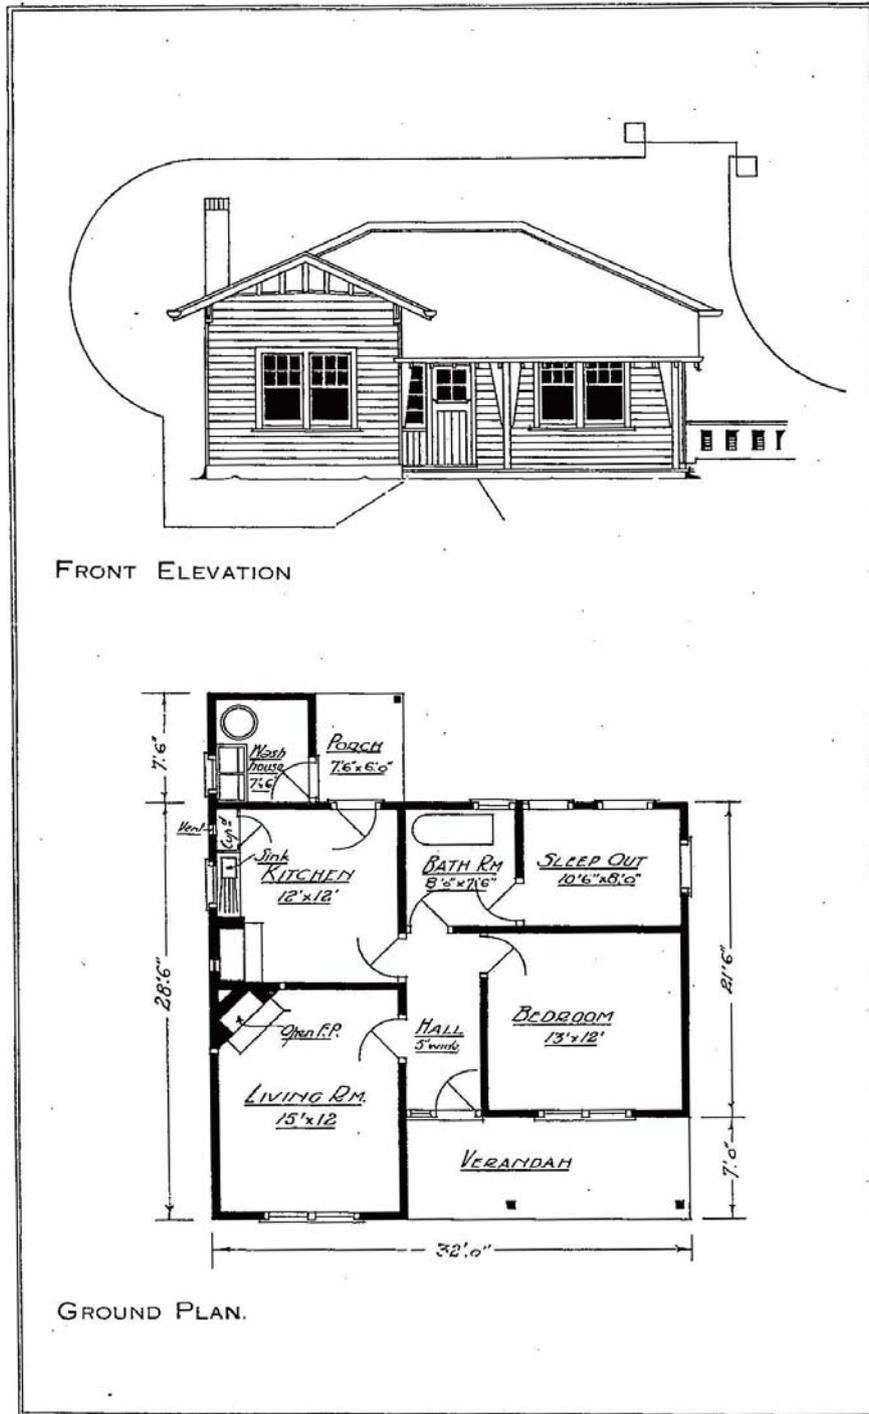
G. Burrige Leith, 'Type T31' Cottage Design. Source: *The State Savings Bank of Victoria Design Book: Timber-Framed Dwellings Containing 56 Standard Types*, March 1929, VPRS8933/P0437, Units 2 and 3, PROV.
